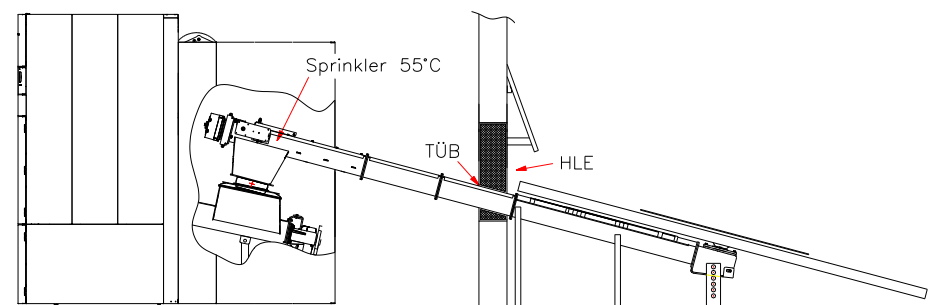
Installation of sloping floor, emergency off switch, air vents, fire extinguisher, wall opening, safety systems
